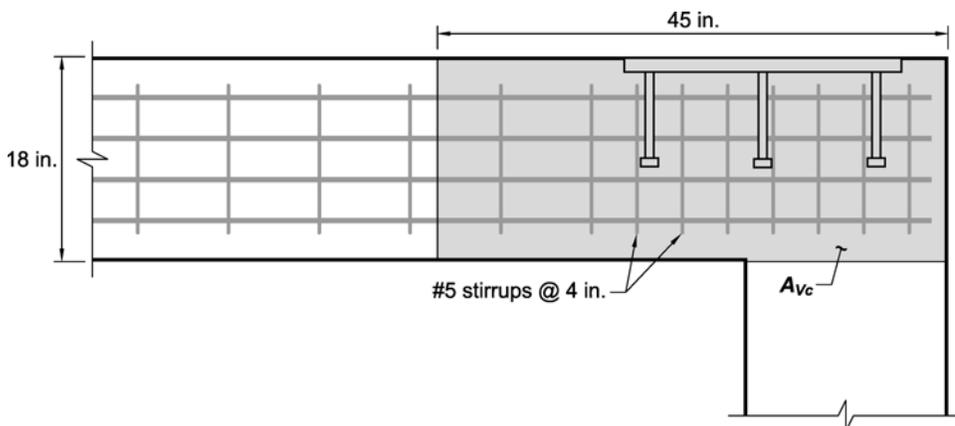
Example 10: Determination of projected failure surface for shear loading—view of girder soffit.
